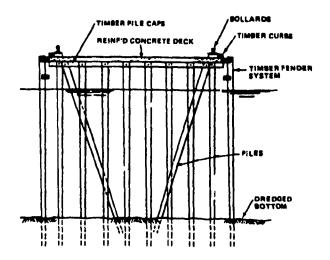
SINGLE-DECK OPEN PIER<sup>13</sup>
